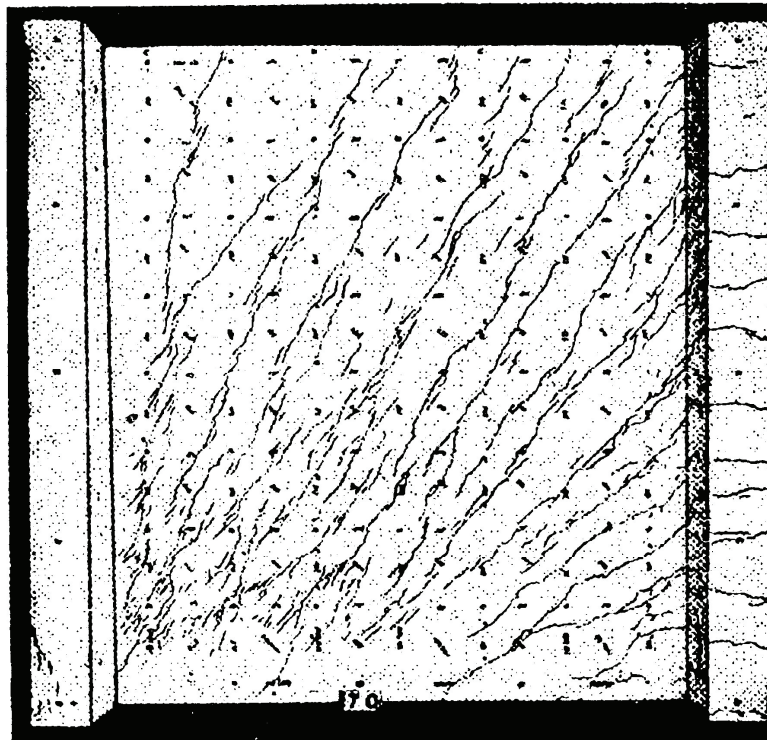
Cracking pattern for wall S2 tested by Maier and Thürlimann (1985) at first yielding of flange vertical reinforcement
